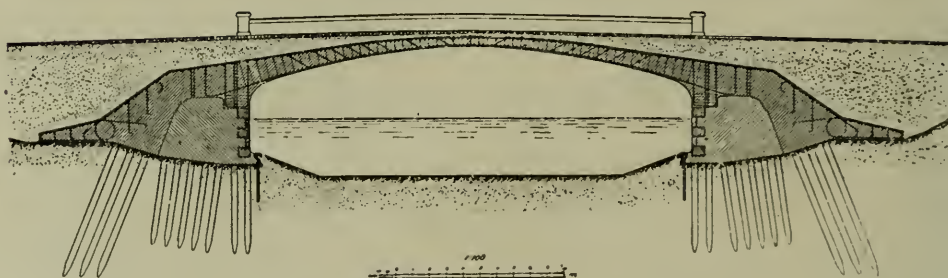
SCHAARTOR BRIDGE: SECTION SHOWING OLD MASS CONCRETE FOUNDATION BLOCKS EMBODIED IN THE NEW STRUCTURE.
